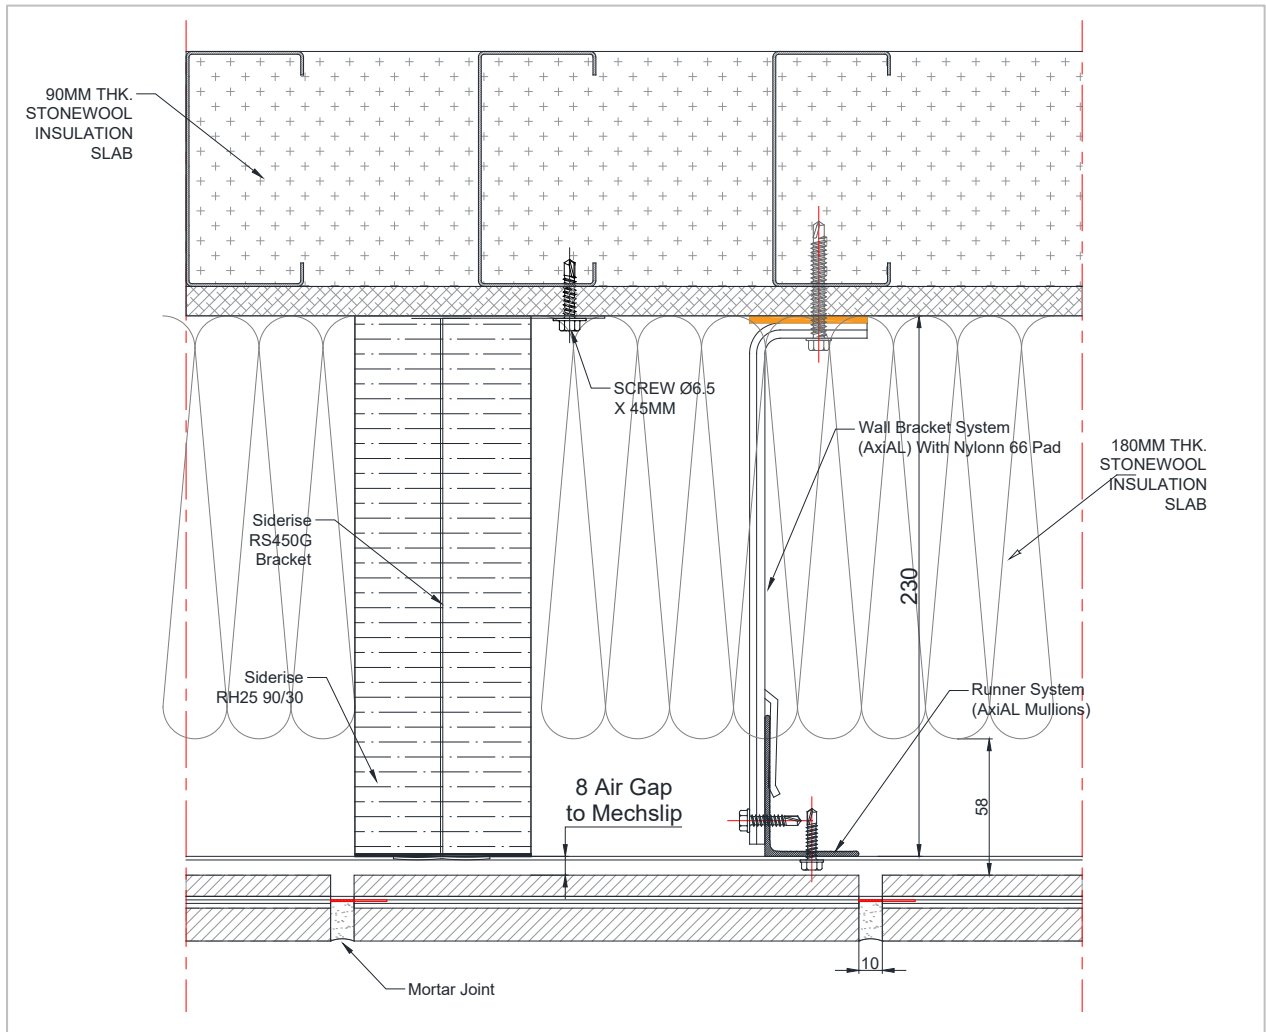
Horizontal sectional views representing the layout the wall brackets and runners.
